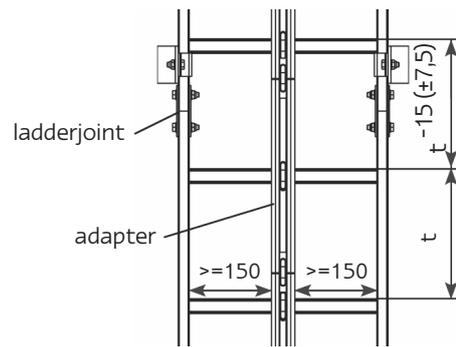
Ladder joint in accordance with EN 50308 near the towerflange
